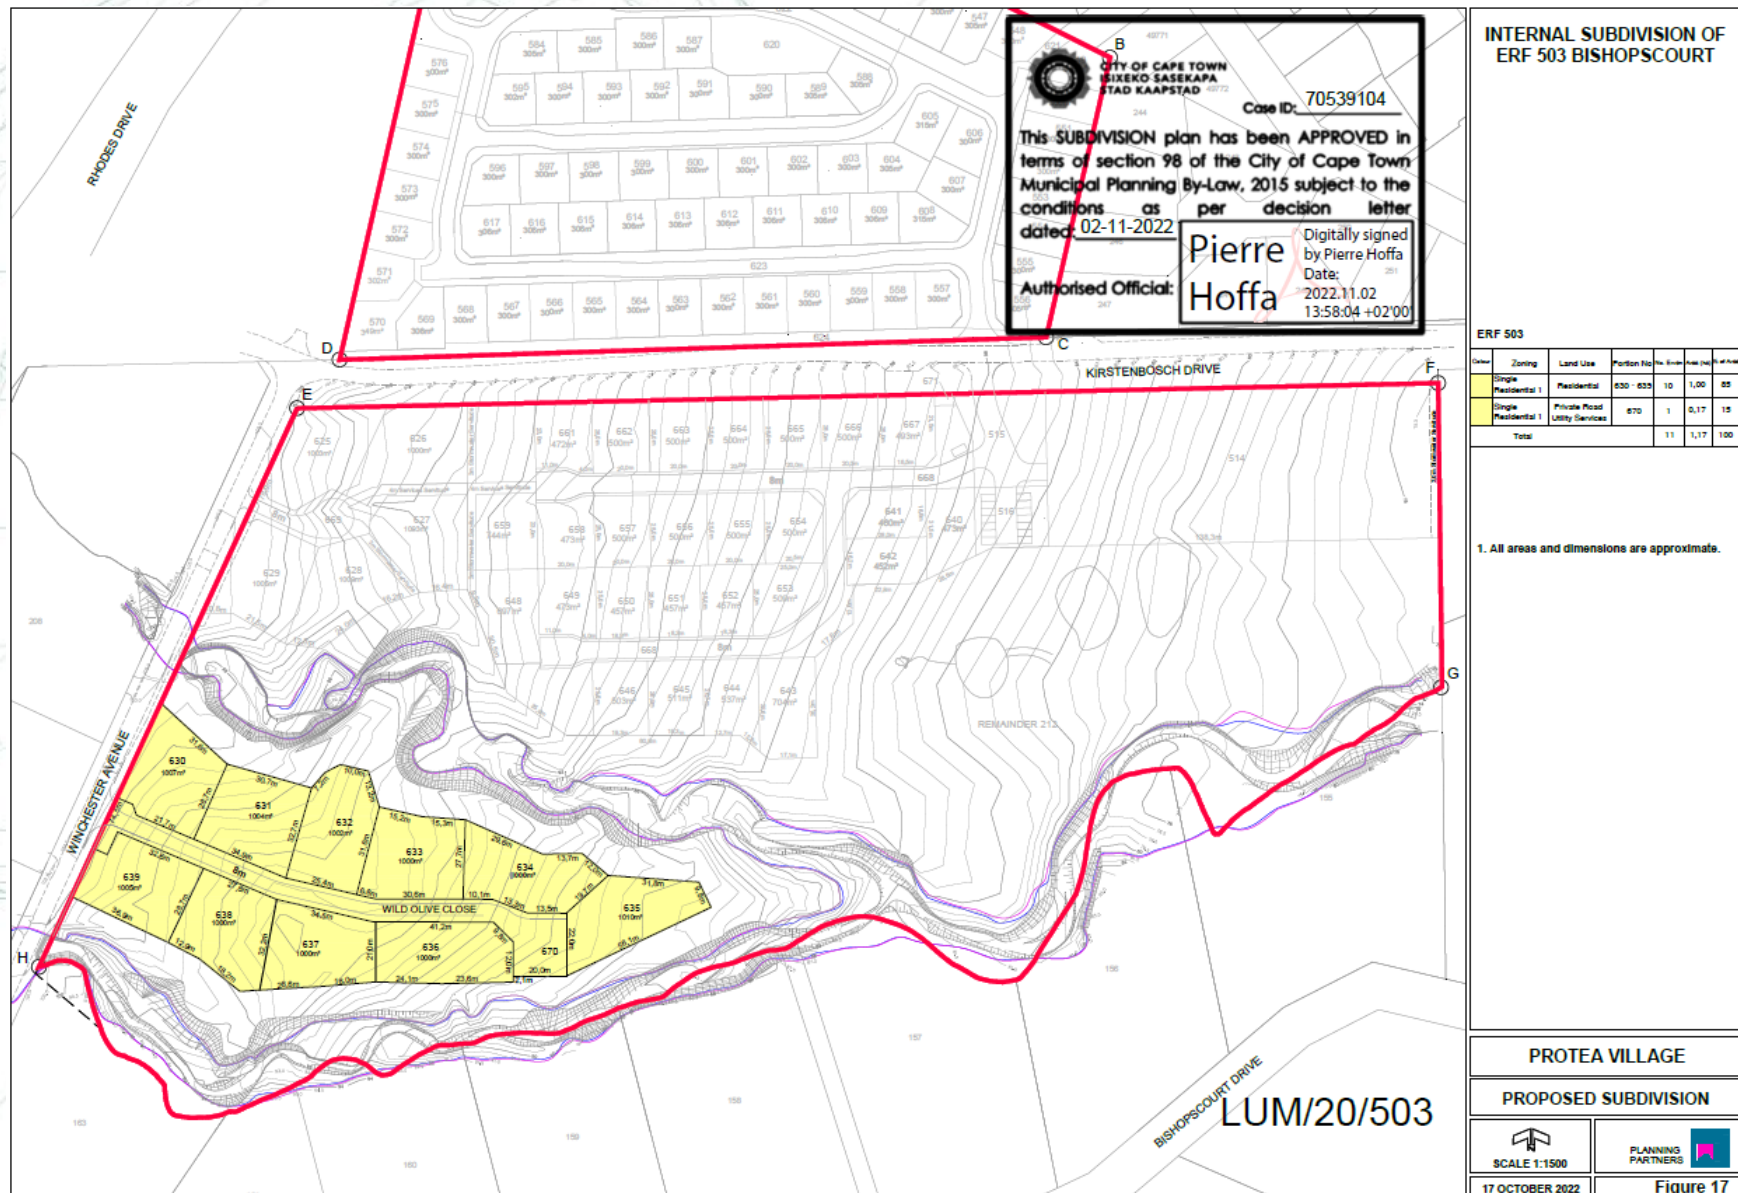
Site Development Plan of preferred alternative for the Protea Village Phase 2 Development (Source: Planning Partners, 2025)
